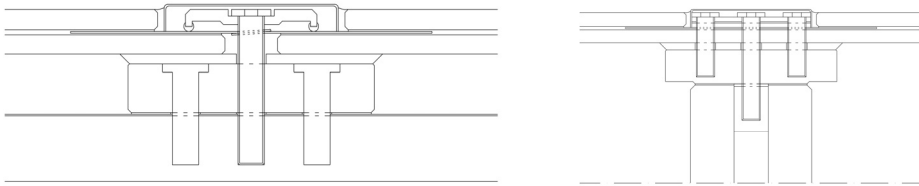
, b ATP main beam – roof plate joint; vertical sections in two perpendicular directions.
